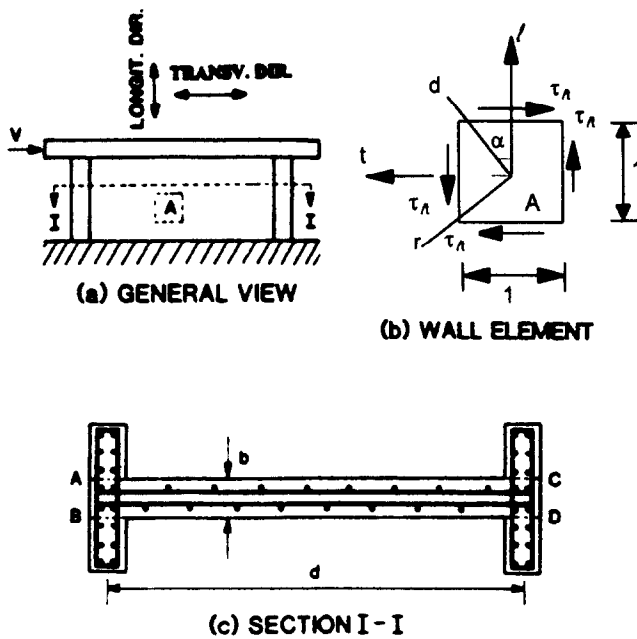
Low-rise shear walls. (a) General view, (b) wall element and (c) section I-I.
